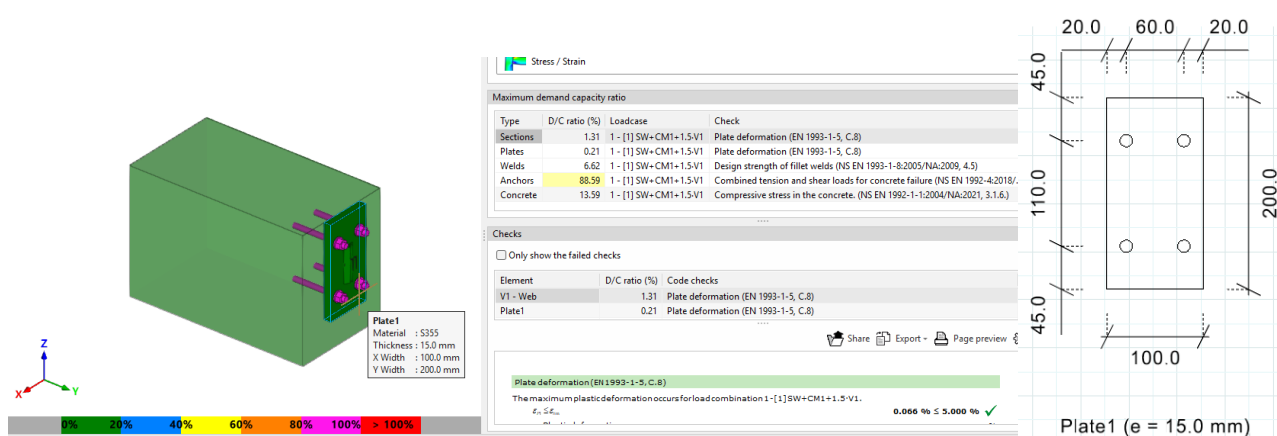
Checks of anchors to existing concrete beam and holes disposition
